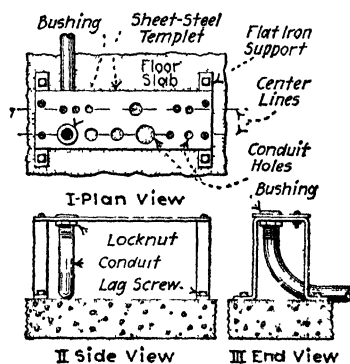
Subvented sheet steel templet for conduit, supported on a flat-iron base.
